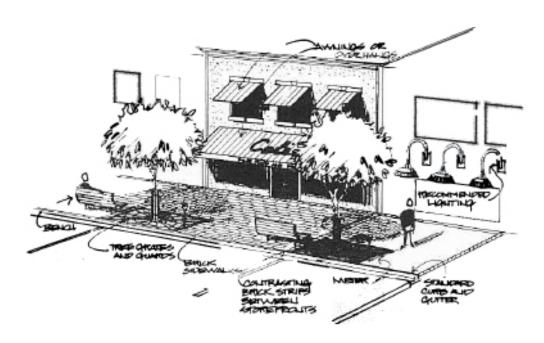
STREEETSCAPE FOR A TYPICAL STOREFRONT
